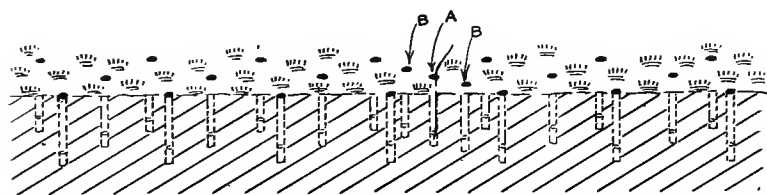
SHOWING CORRECT METHOD OF LOCATING EXTRA CHARGES—"B" TO CARRY DETONATION FROM THE SINGLE PRIMER, "A" TO THE OUTSIDE LINES. THIS IS USED WHEN NO BLASTING MACHINE IS AVAILABLE
